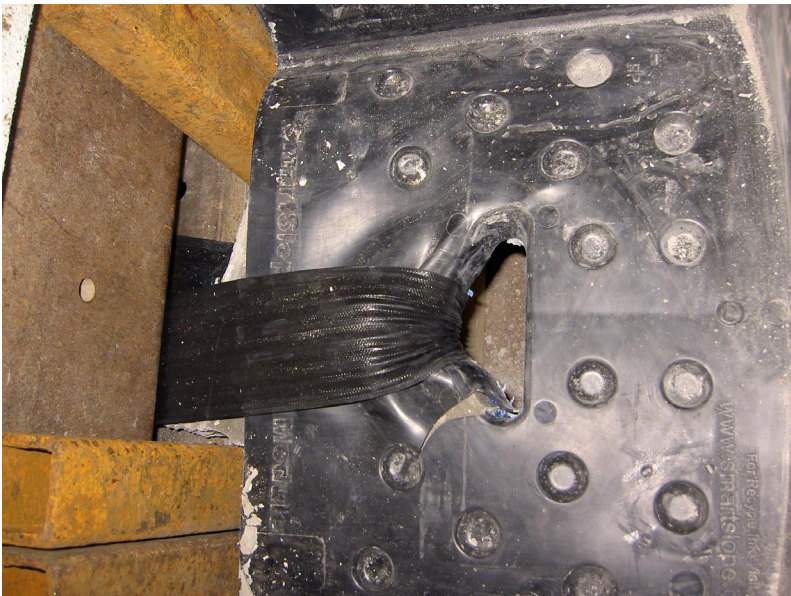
Top View: failure of SmartSlope block and liner at the completion of a connection test
